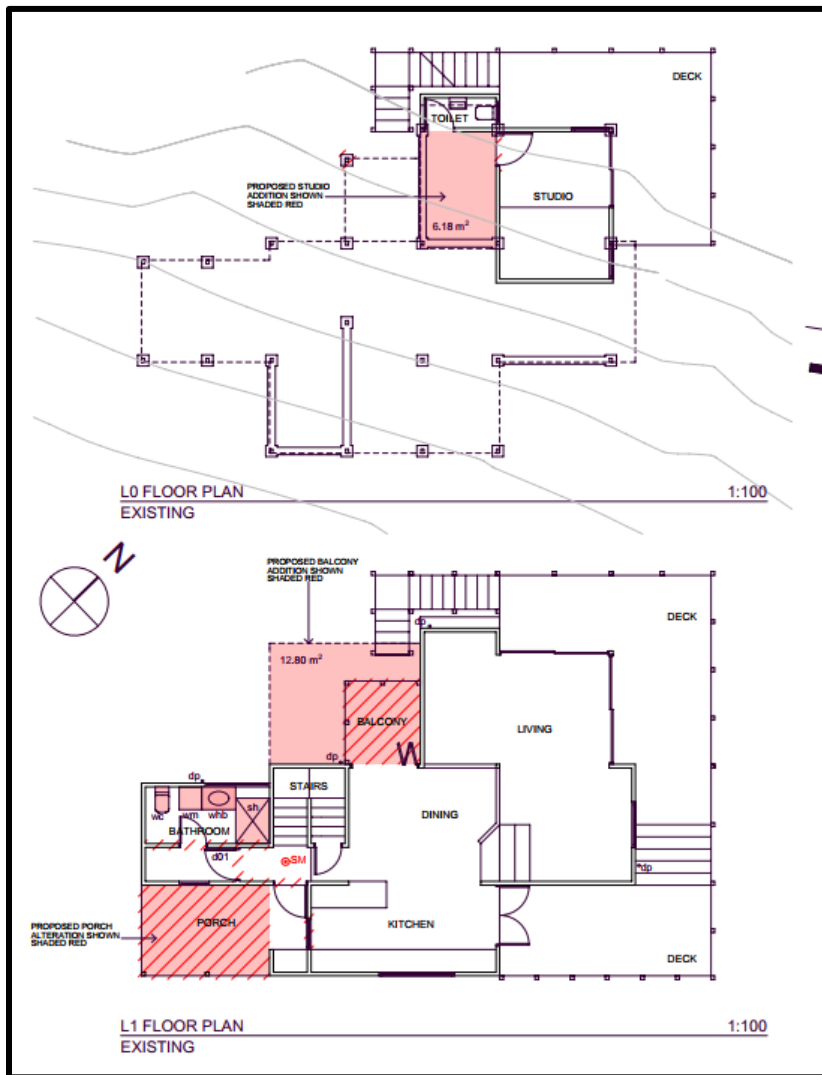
Existing floor plan. Studio addition will be located where an existing covered deck area is. Proposed porch alteration creates breaches under the DP.
